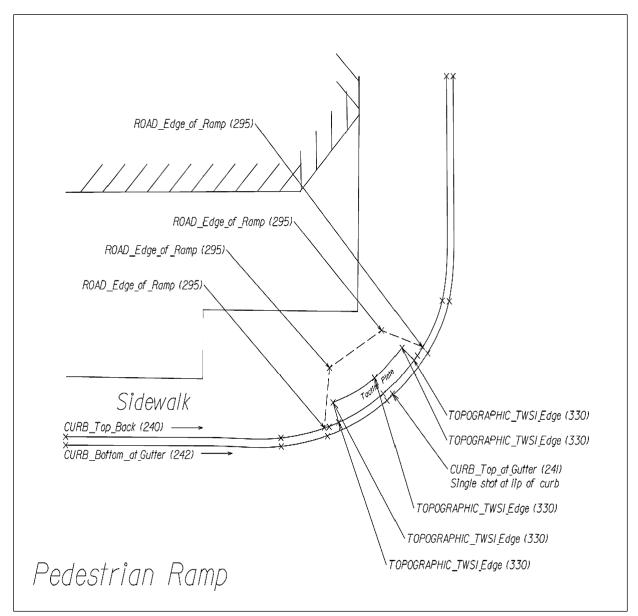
Survey requirement and pick-up for pedesetrain and sidewalk ramps
